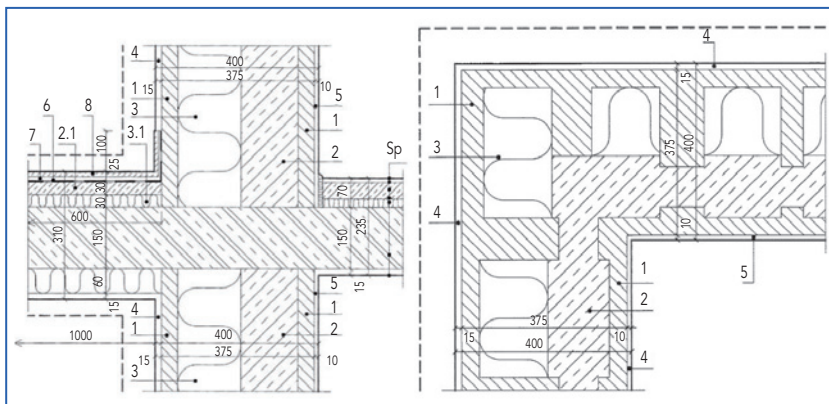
Details of brick system on the basis of organic material filled with concrete- floor junction with balcony (left), corner joint of structural walls (right) [10].
